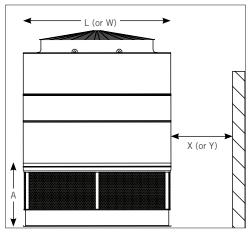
Section View of a PT2, PFi, or PCC Unit Adjacent to Wall
